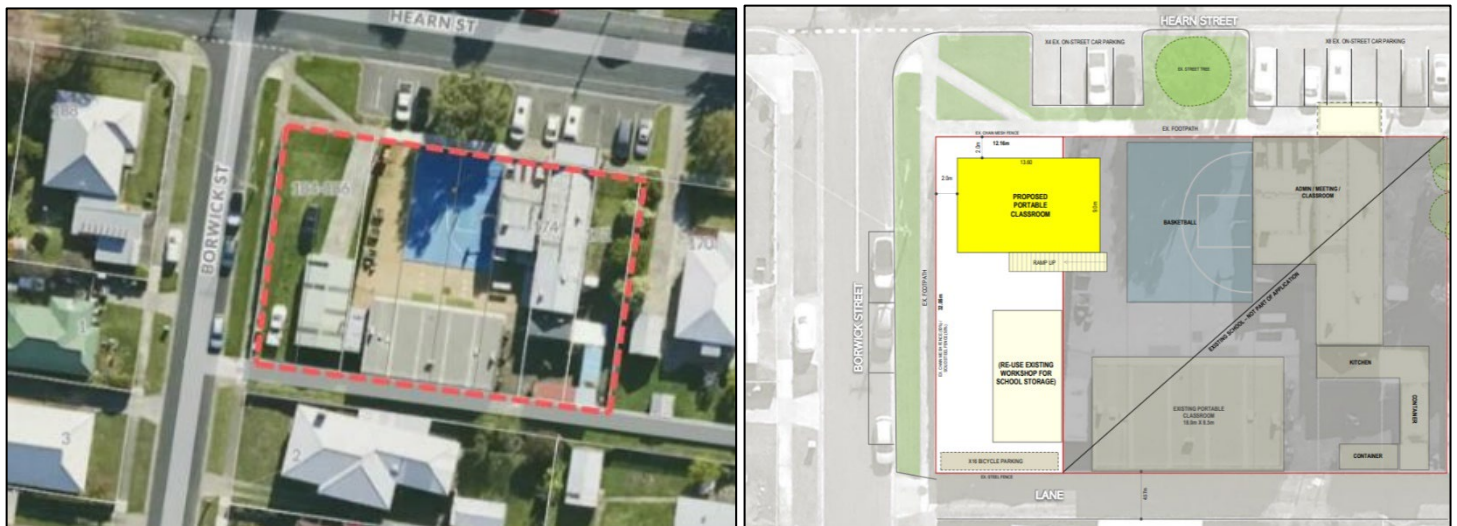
Aerial Site Plan (left) Figure 2: Site Context Plan (right)
